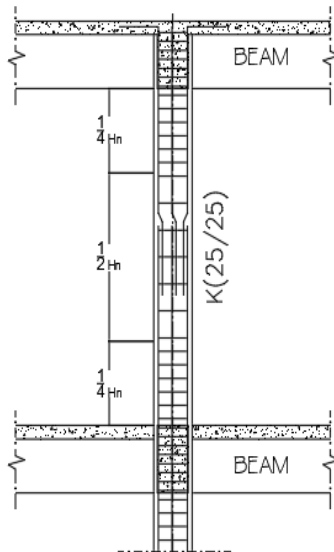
Reinforcement Sketch of a Reinforced Concrete Beam and Column
